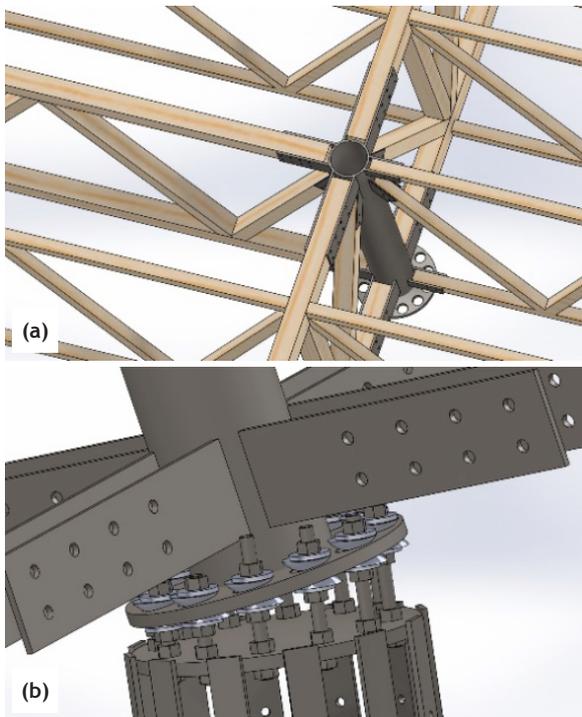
(a) General arrangement for moment-resisting connection between leg and trusses. (b) Spherical washer detail.
